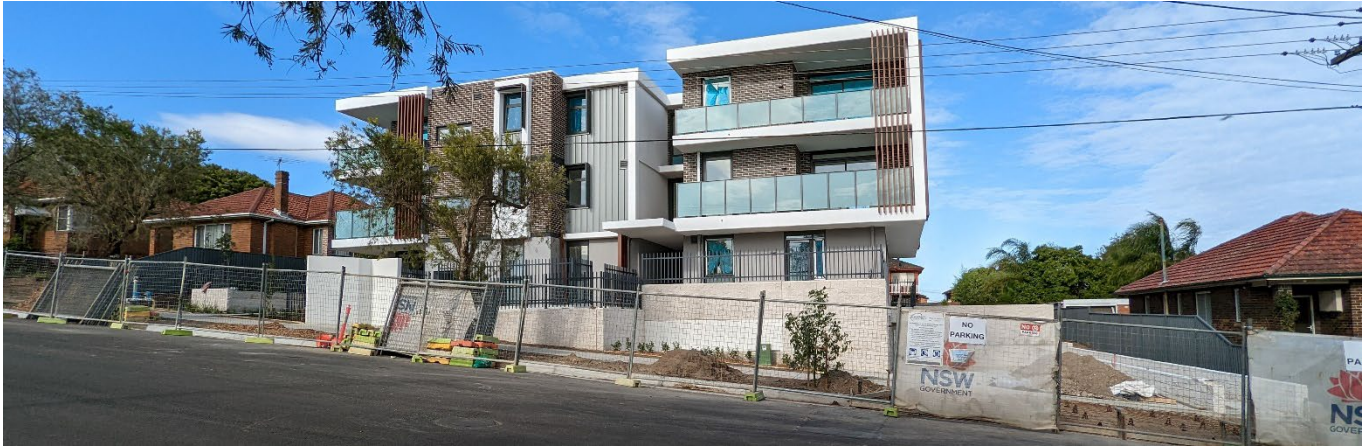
New residential flat building development at 24-28 Viccliffe Avenue north of the site (Source: HMR Planning, dated 16/12/2022)
